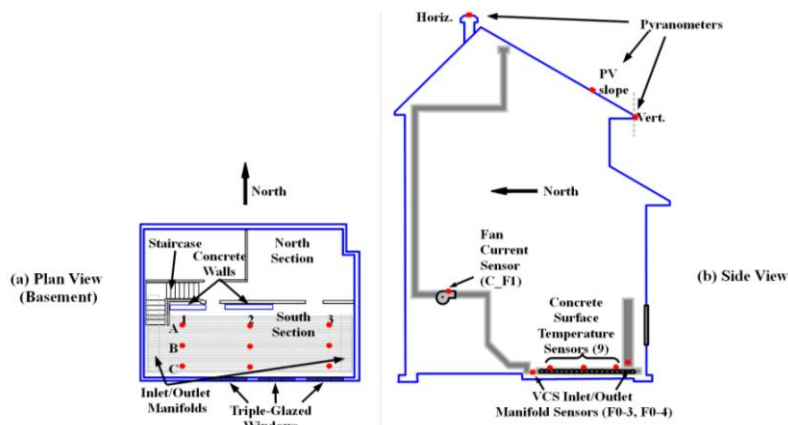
Basement floor plan (a) and side view of the Ecoterra™ house (b) with location of sensors.
